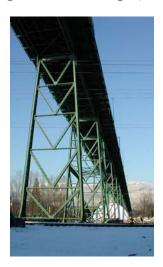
Lions' Gate Bridge, North Approach (courtesy of Bruce Hamersley)
